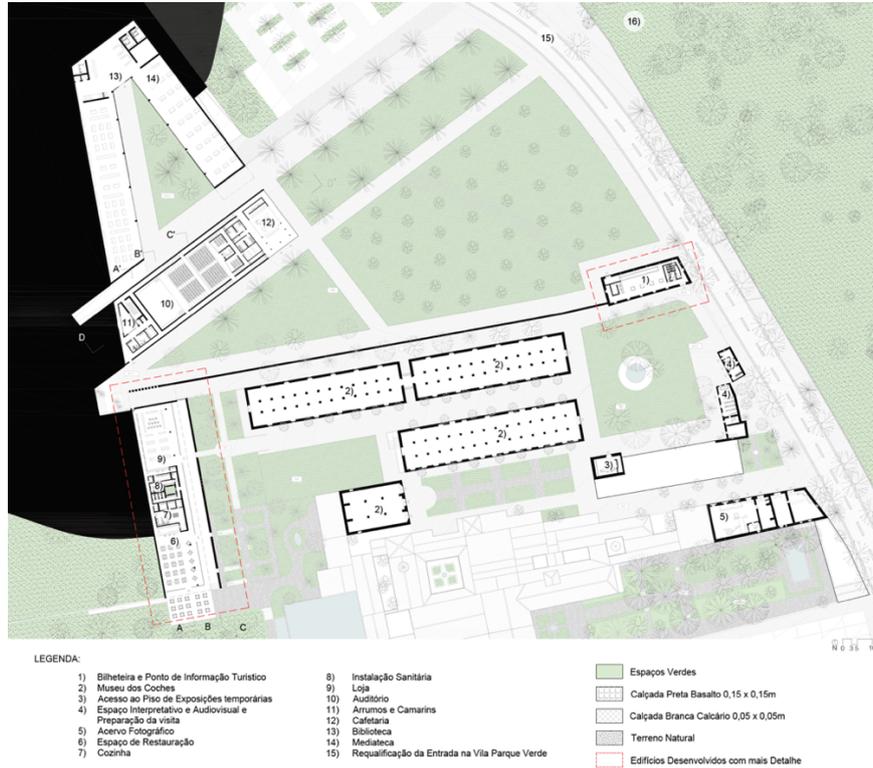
Plan of the proposal highlighting the buildings developed with more detail. (Font: Author, 2017)
